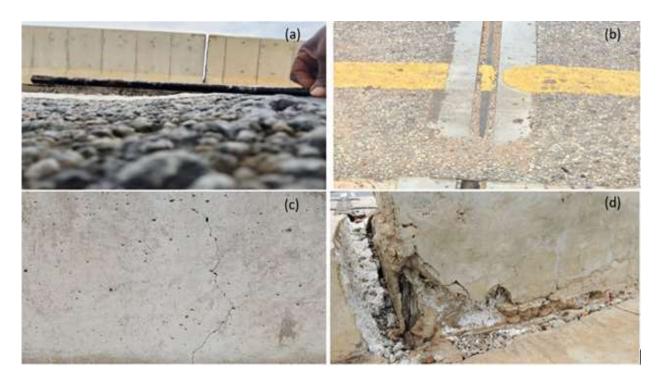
Photos of defects on Nyahua bridge (a) wearing course depression (b) blockage of expansion joints by iron welding and siltation, (c) cracks on the abutment, and (d) edge ripping on barrier wall (concrete parapet)
